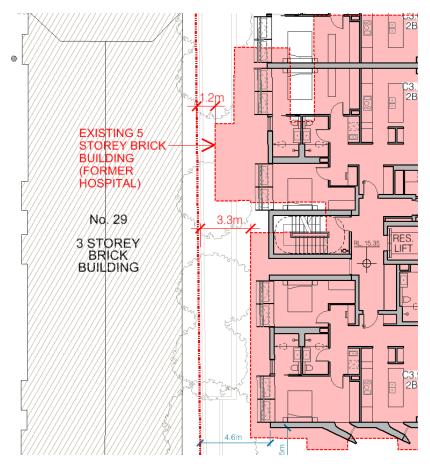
Floor plan overlay diagram showing the existing building footprint at No 19-21 South Steyne (in red) overlaid with the proposed DA residential level floor plan (level 3).
